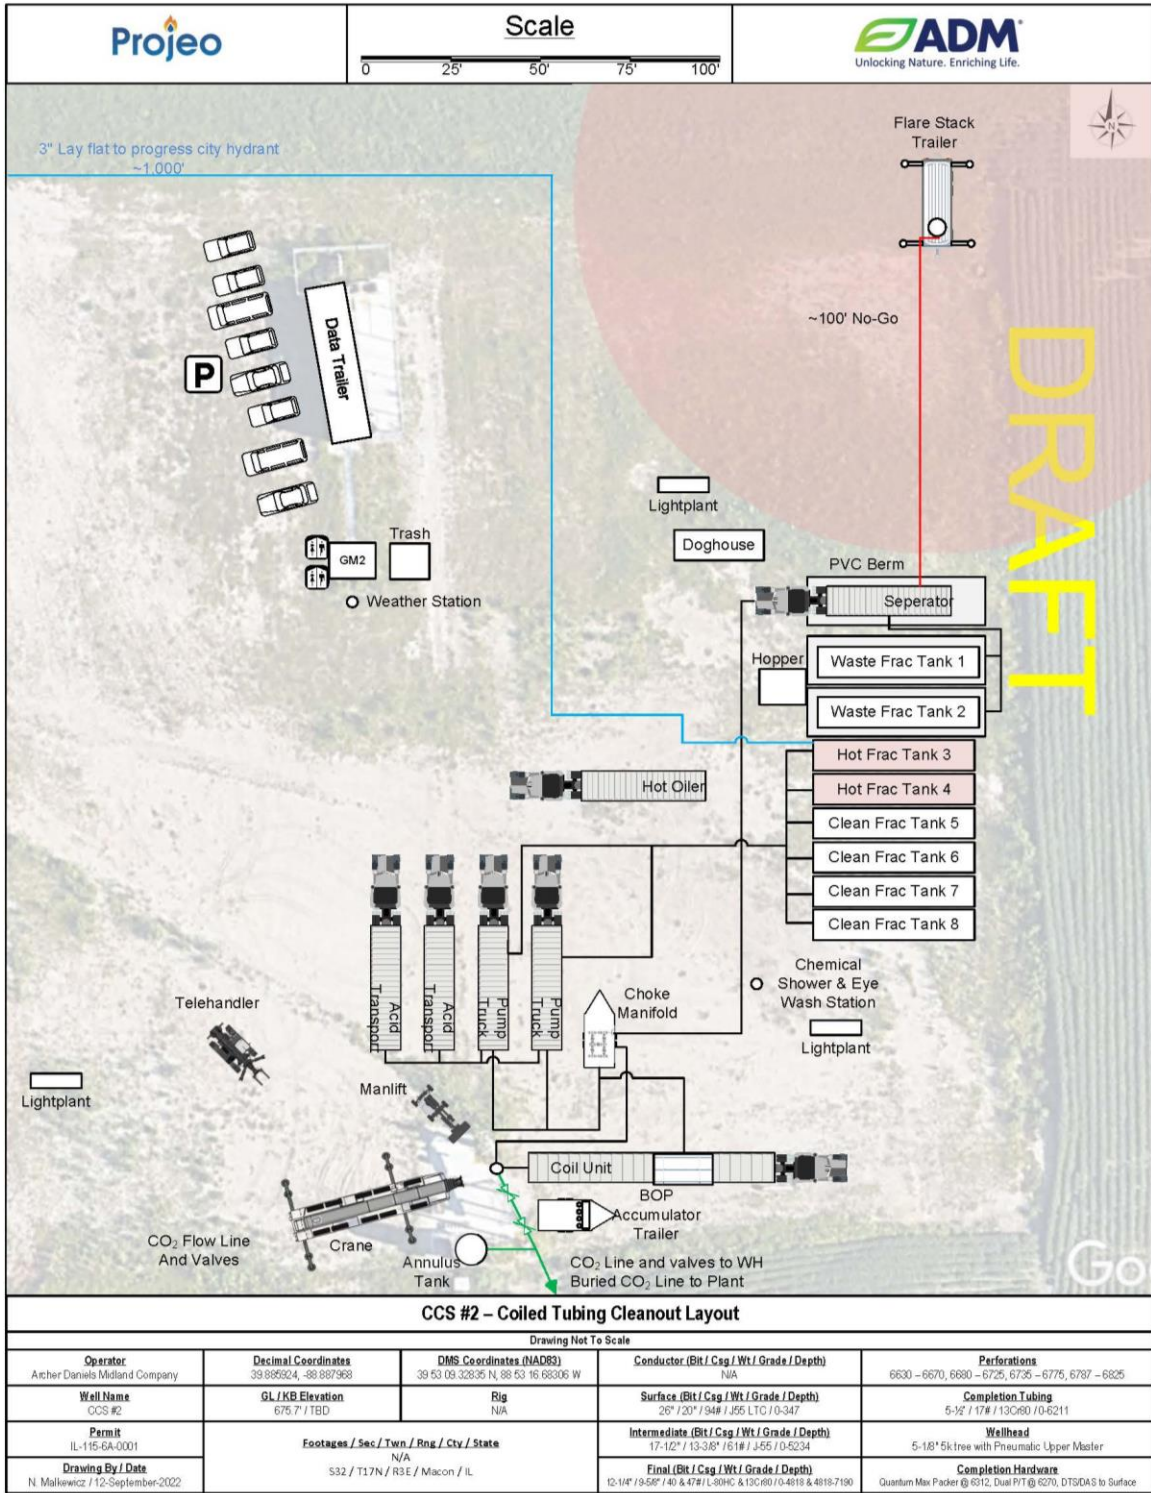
Representative plan for site layout during coiled tubing cleanout on CCS#2 well. Actual plan may differ in equipment and configuration.
